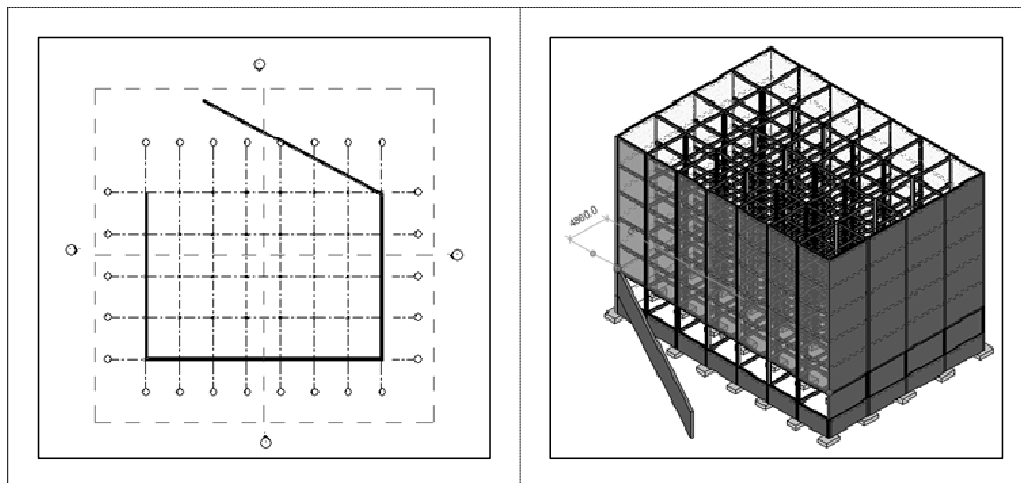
The floor plan of the basic wall and the three-dimensional view of basic wall.
